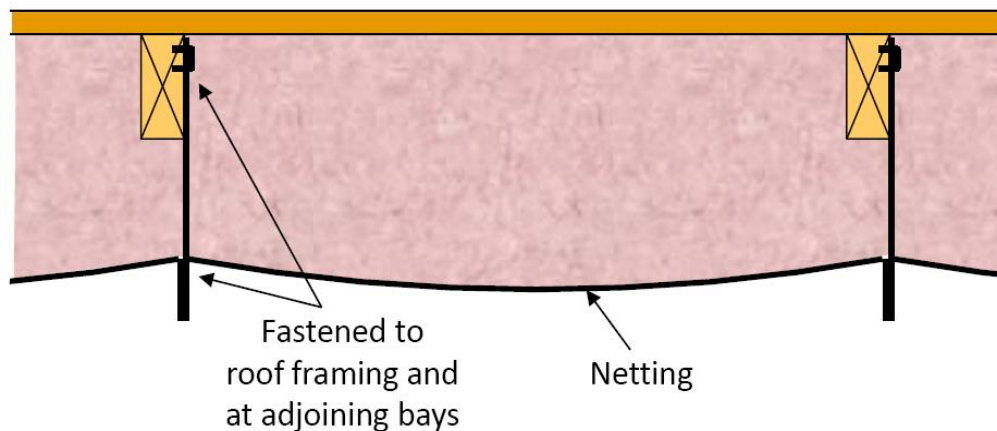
Netting insulation installed below the roof deck. Image courtesy of Owens Corning².
